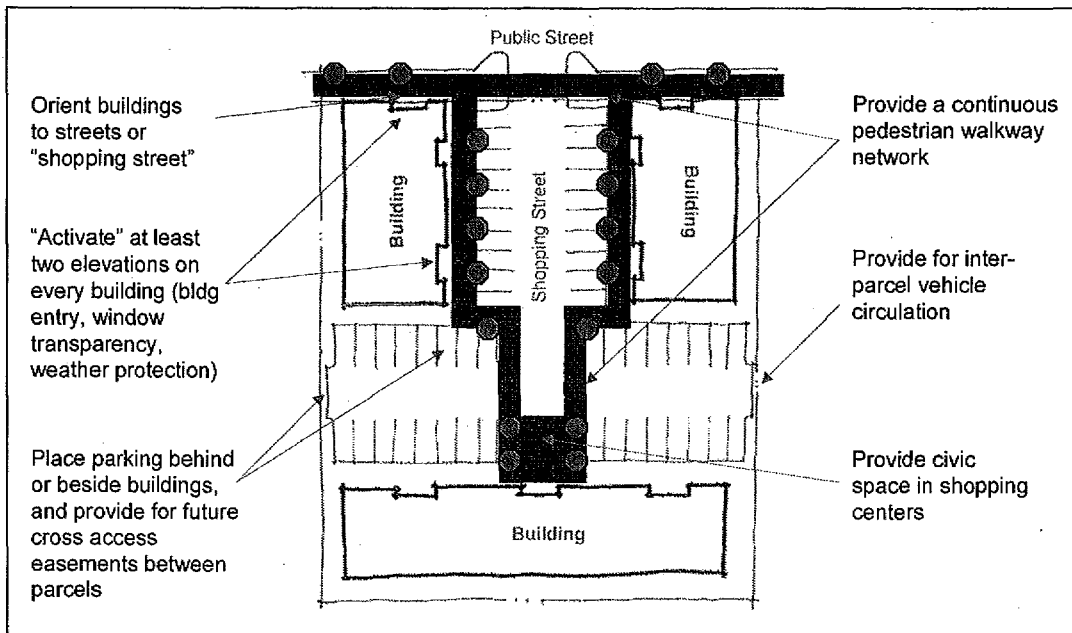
B: Alternative Shopping Street Block Layout
